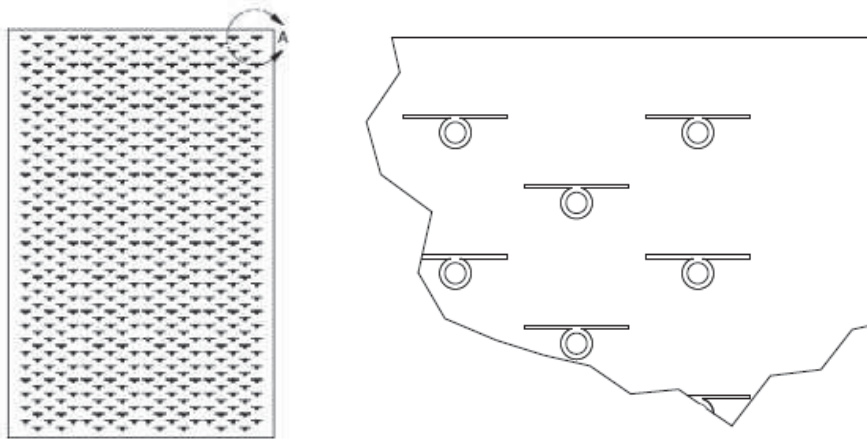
Concrete Module new section design, (left side: section, right side: detail)
